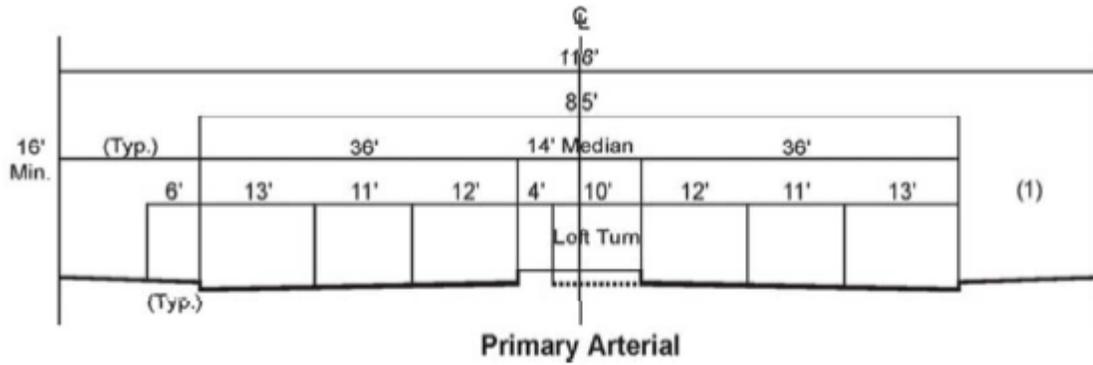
CITY OF PERRIS GENERAL PLAN ROADWAY CROSS-SECTIONS
